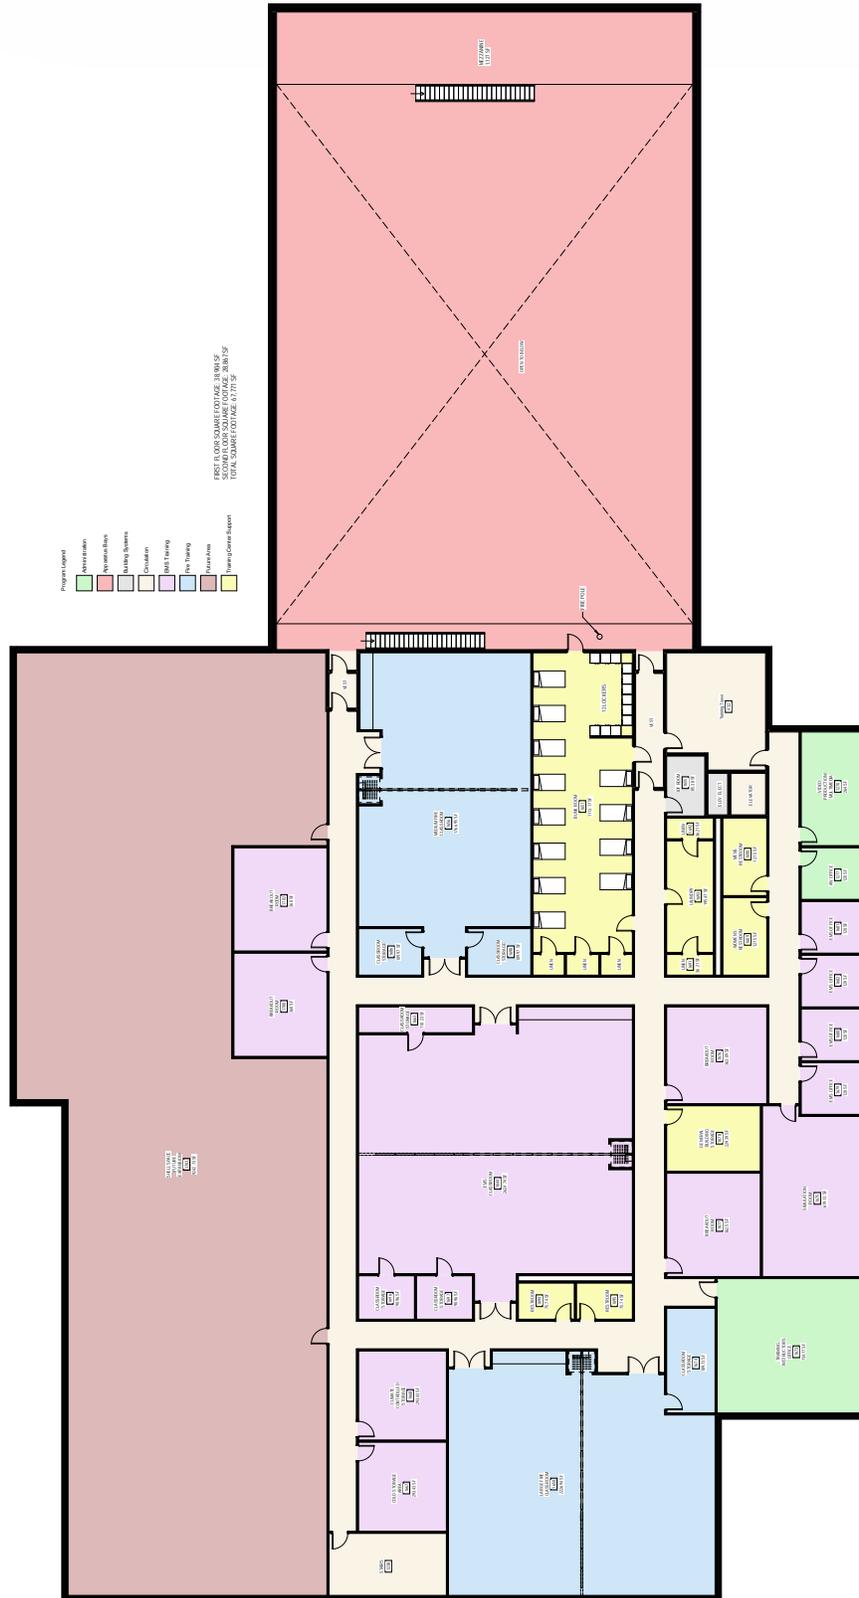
Floor Plan Concept Option 2, Second Floor - New Build
